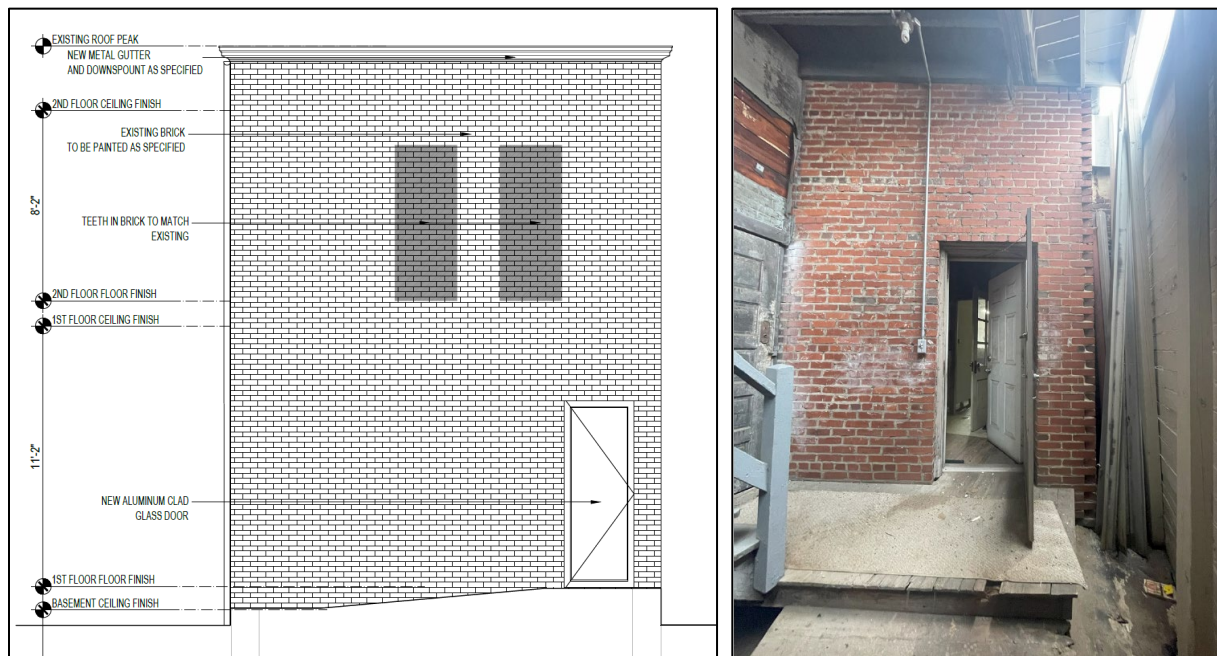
Rear elevation of subject property, showing the anticipated conditions inside the frame addition (left) and existing door opening on the first story (right).
